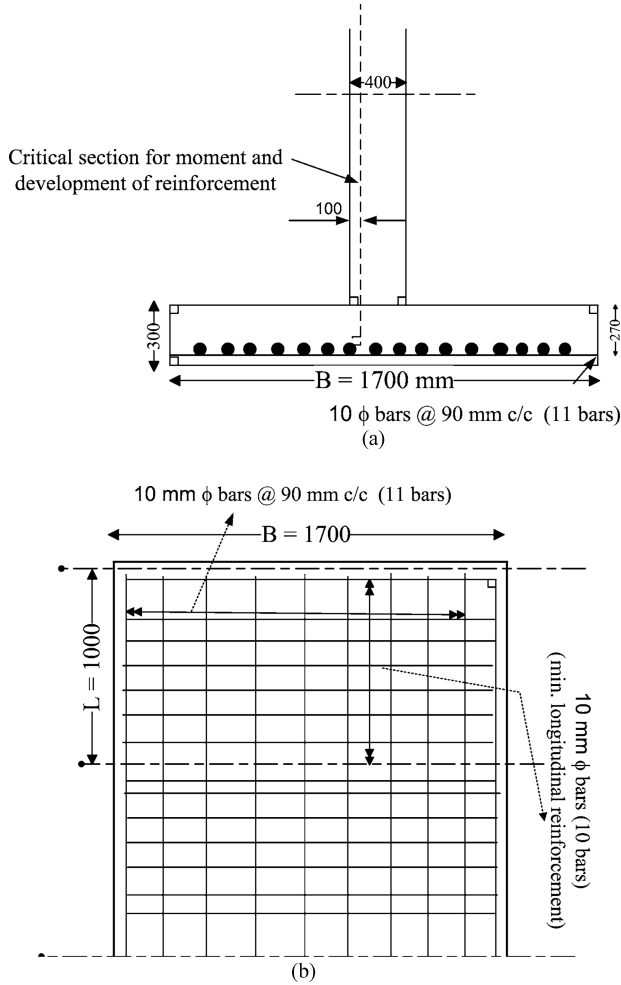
C.7 (a) Sectional elevation showing reinforcement; and (b) Reinforcement in the footing base (Example 12.3).
